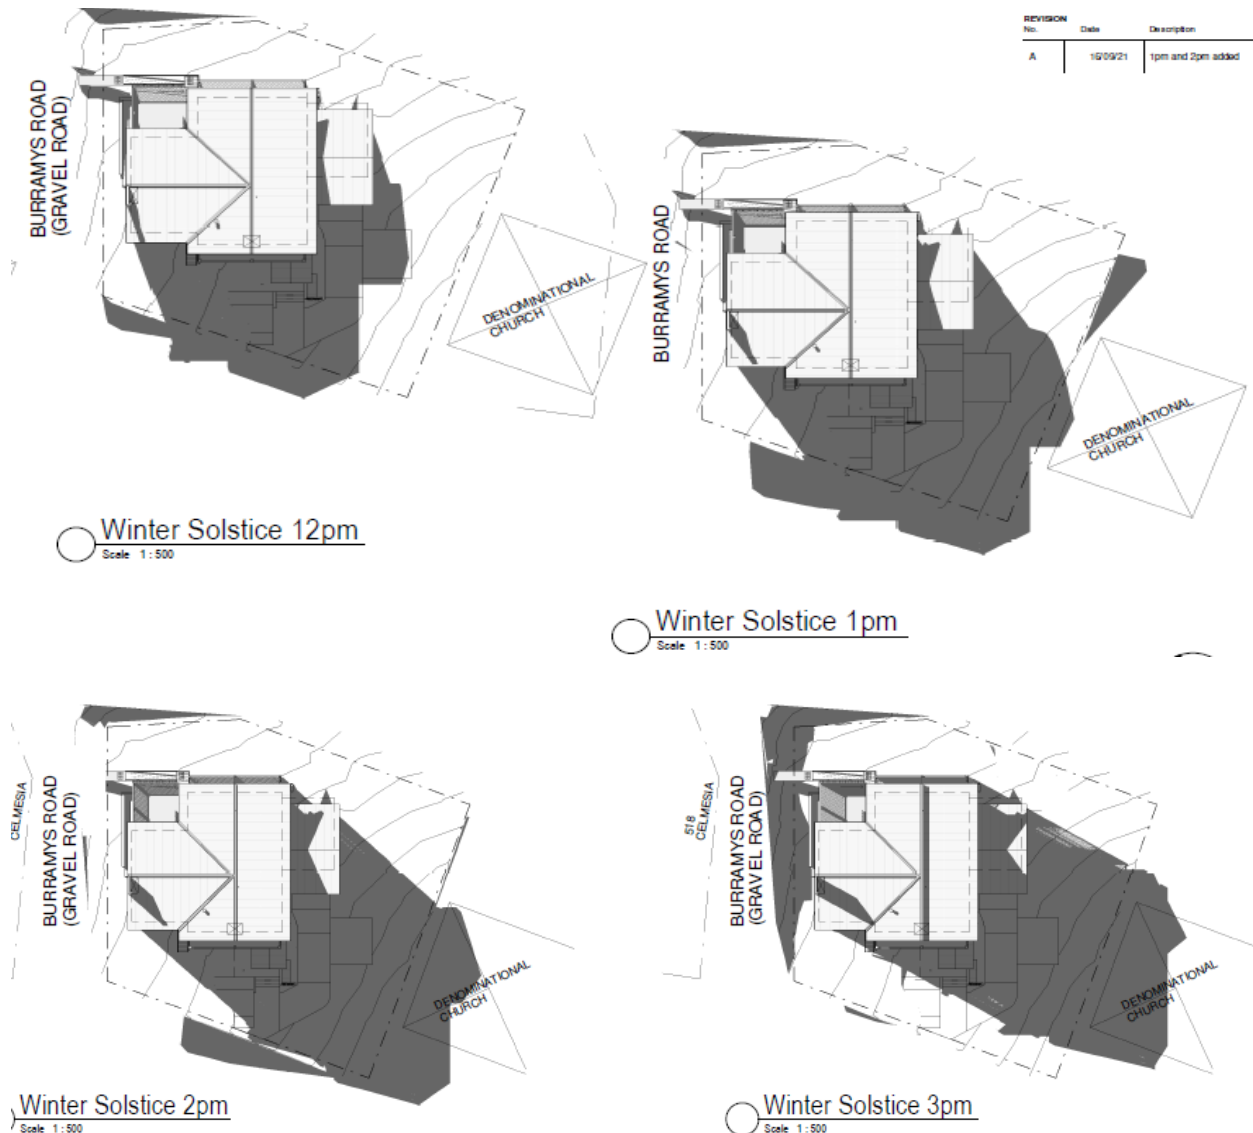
| Expected shadows from the proposed development onto the adjoining Alpine Church (Source: Applicant's documentation)
